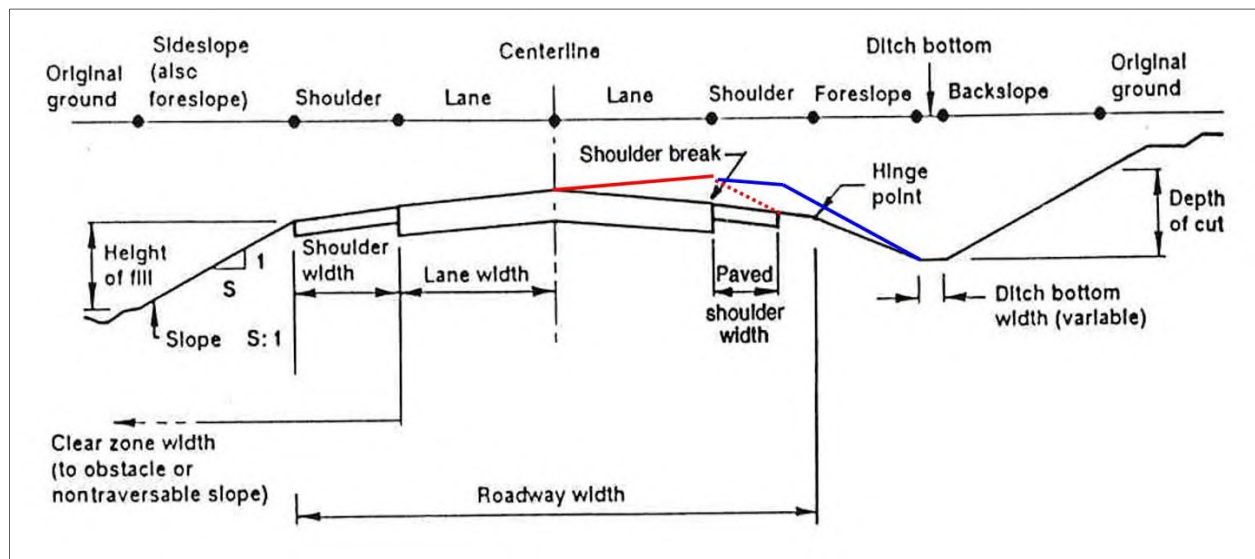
Illustration. A typical cross section of a normal crown with the red and blue lines showing a typical cross section of a superelevated section.
